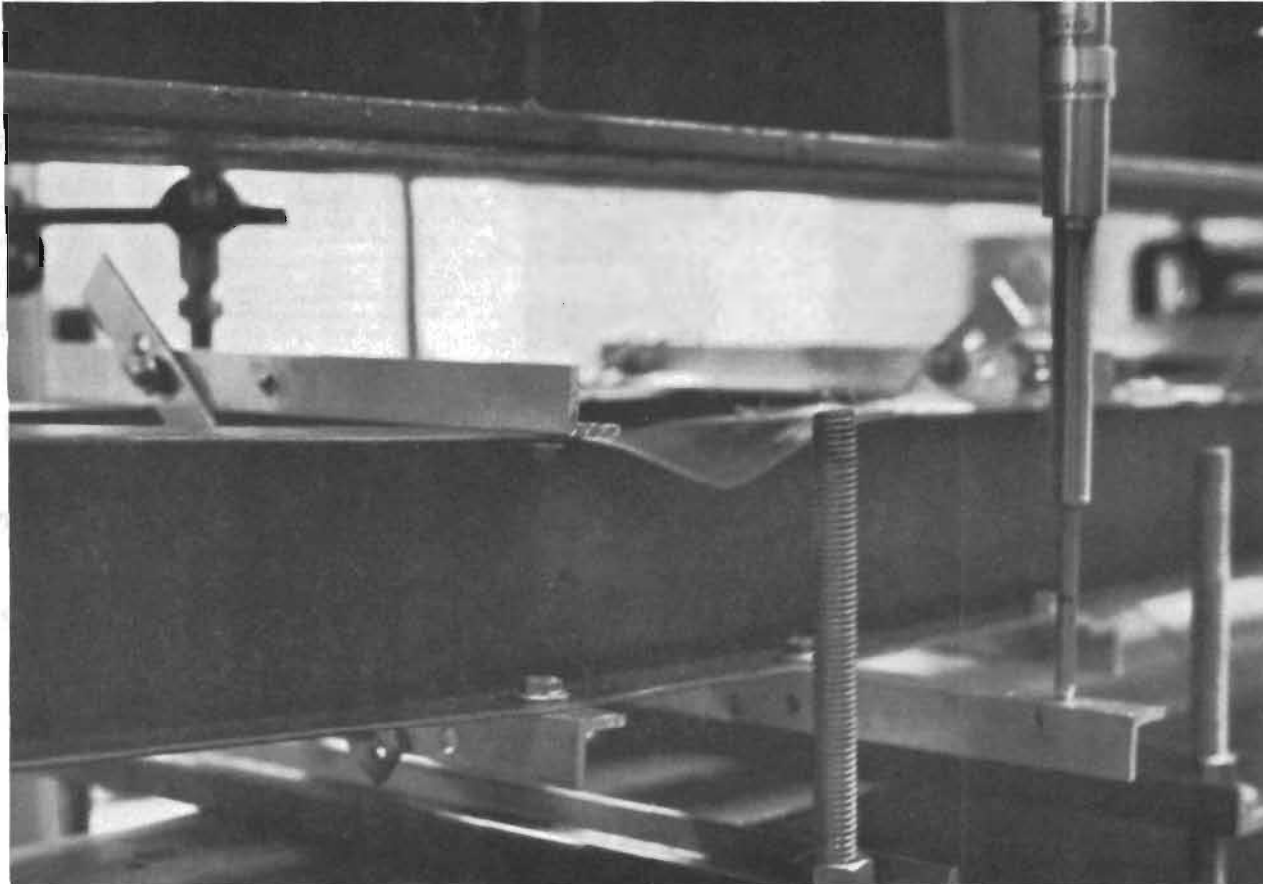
Typical Failure of Channel Beams with Unstiffened Flanges
